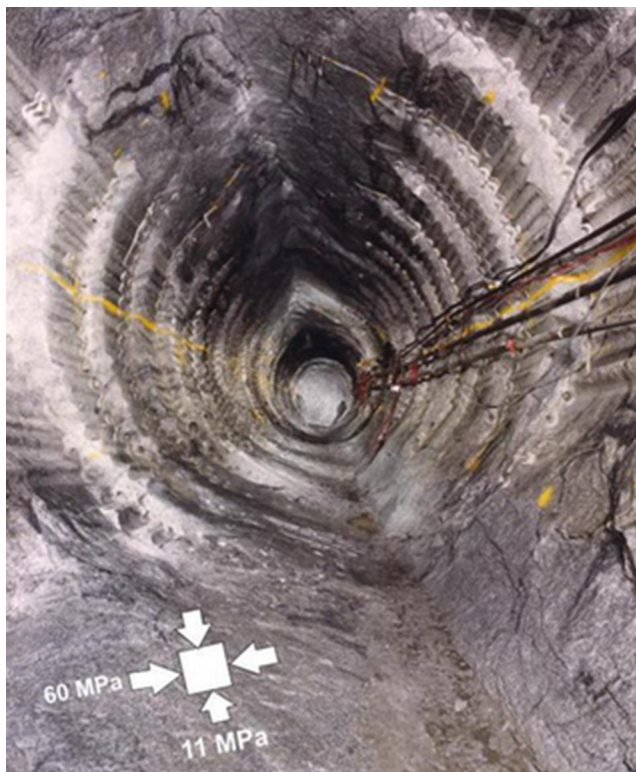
Spalling in the roof and floor of a circular test tunnel in the Underground Research Laboratory at Pinawa in Manitoba, Canada. Photo courtesy of AECL.
